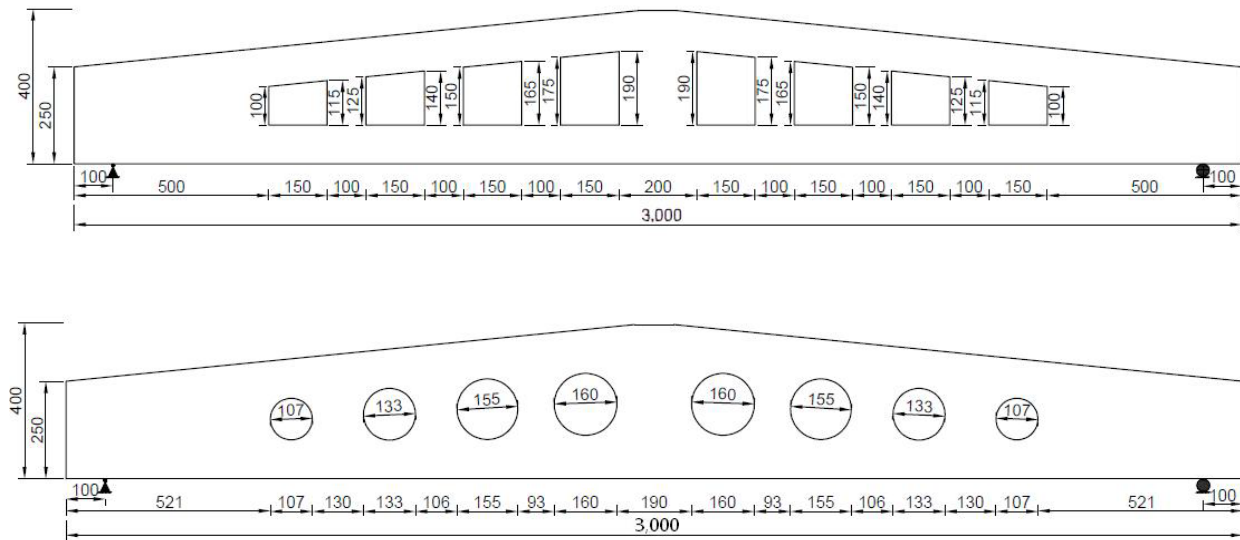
Shapes and dimensions of the openings used in the test specimens.
